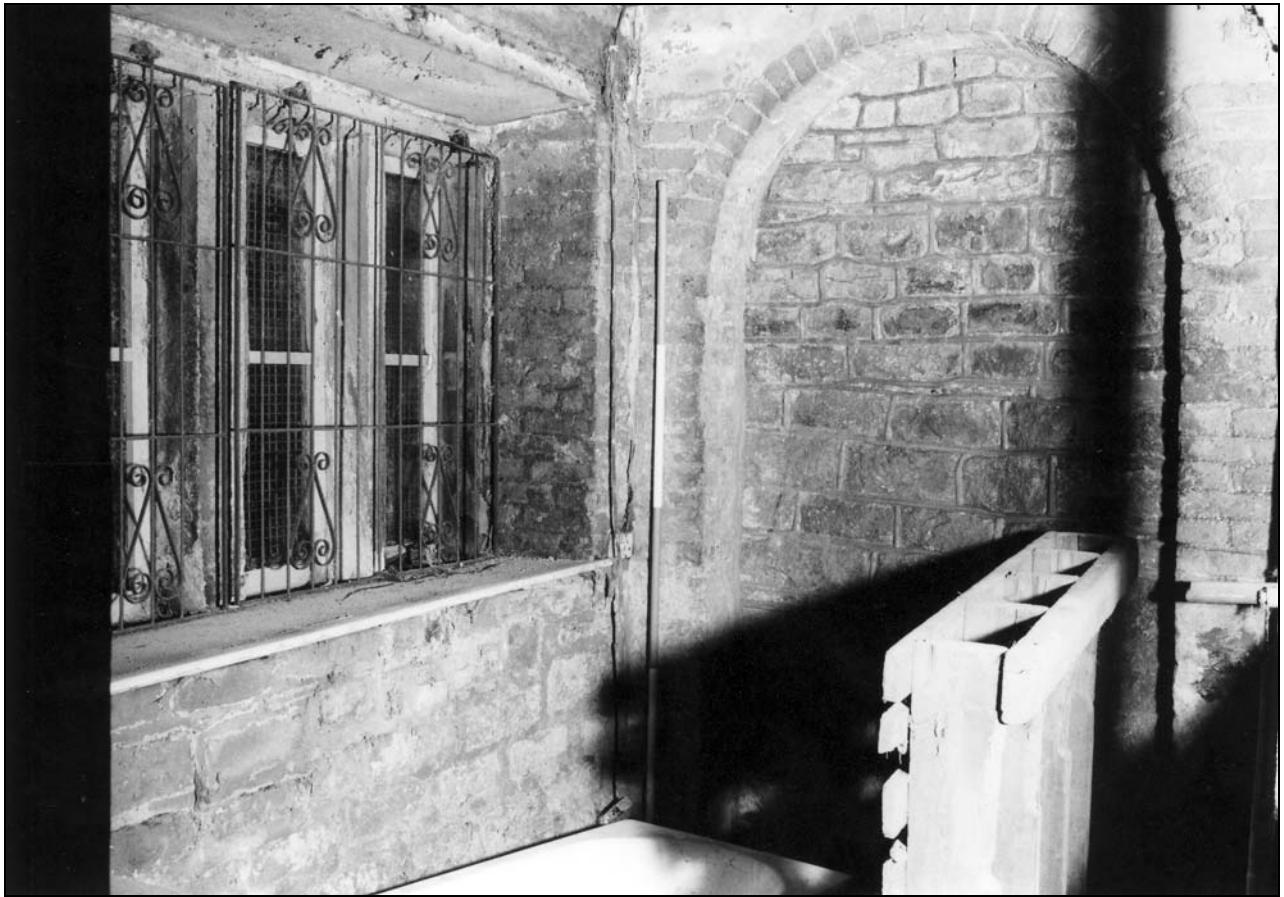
Ground floor of workshop: north-east corner (film 5, frame 4)
